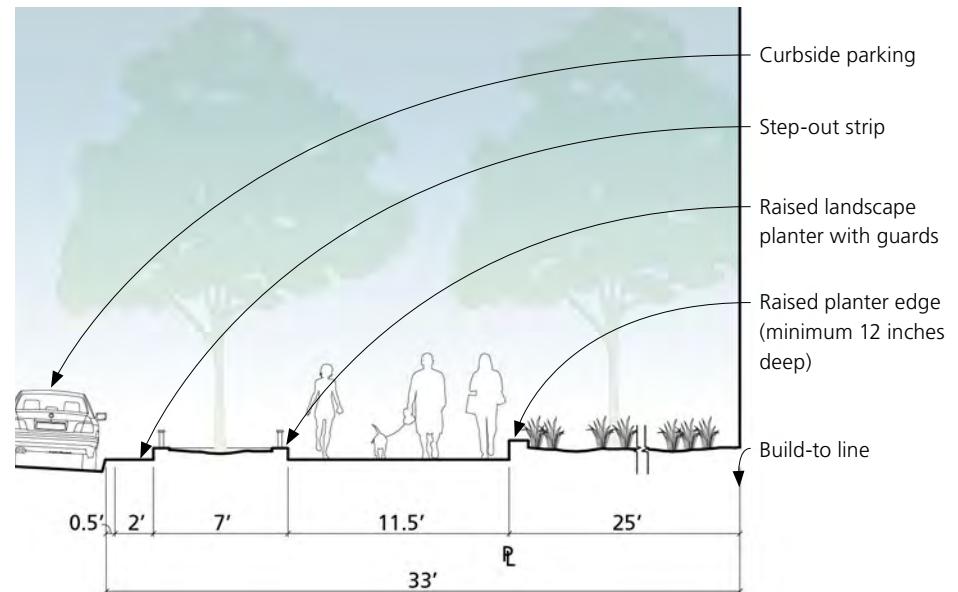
Harlan Street Sidewalk with Raised Planters and Landscaped Setback
